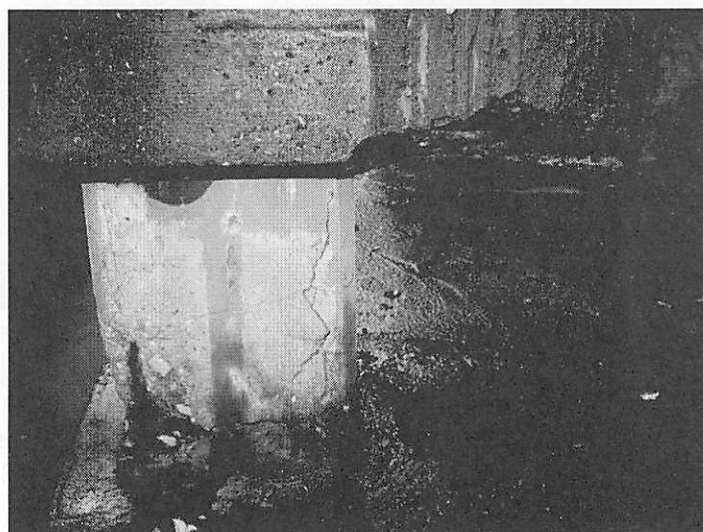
Spalling of concrete in the lower part of columns
